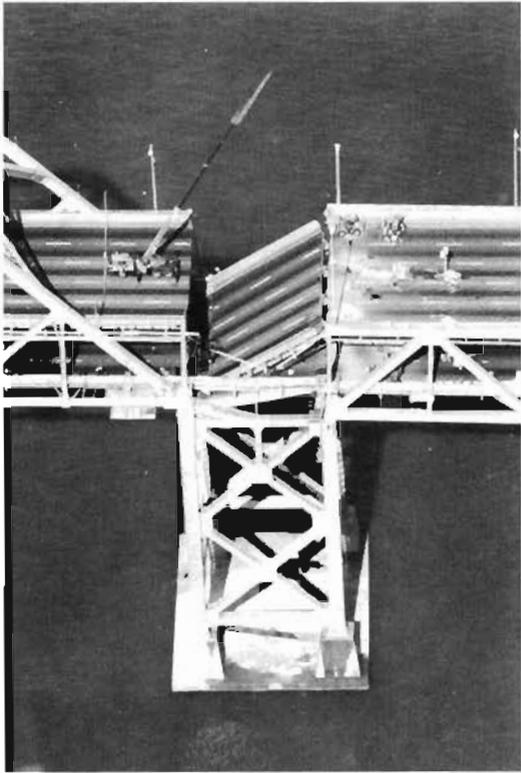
The upper and lower closure spans fell when the bolts attaching the east (right) truss span were severed and the truss span moved to the east, pulling the link spans off their western supports.
